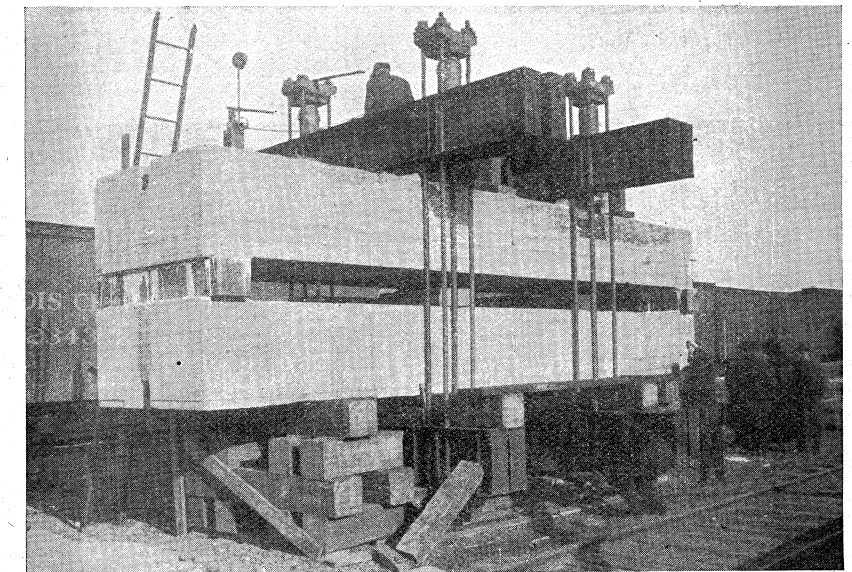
TESTING LARGE REINFORCED CONCRETE FLOOR SLABS FOR TRACK ELEVATION, I. C. R. R.
